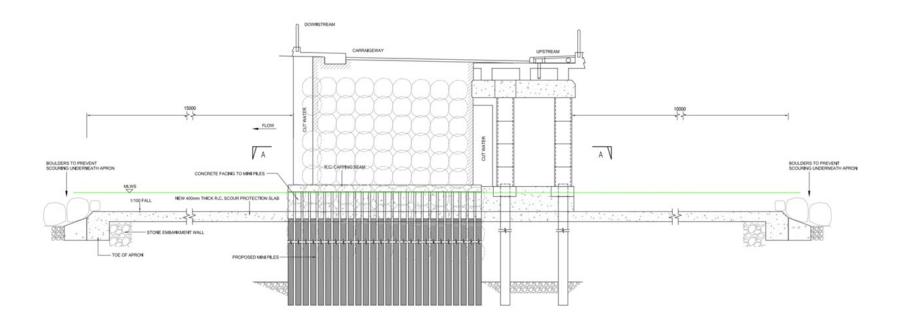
Scour Protection Detail (Not to scale. Extracted from Drawing No. 1008. Refer to Drawing Nos. 1006-1010 for details of scour protection)
